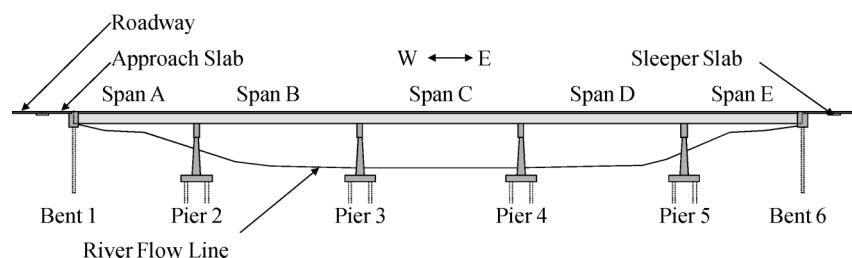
Elevation View of SR-18 over The Mississinewa River
